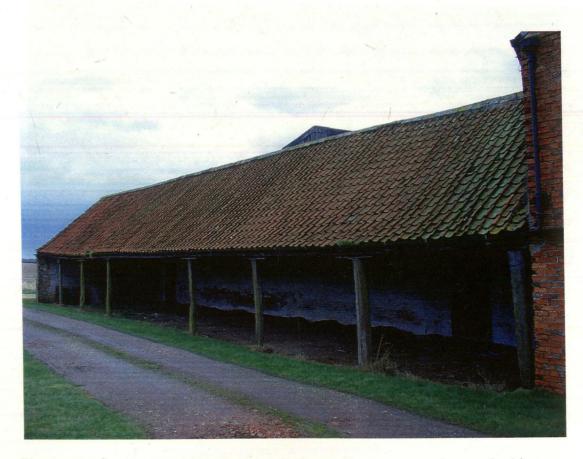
North elevation of shelter/cart shed at northeast corner of range, looking southeast
